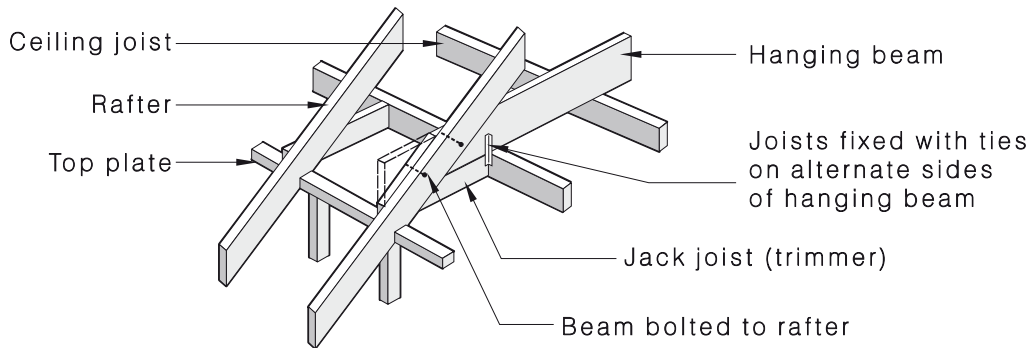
SUPPORT OF HANGING BEAM WITH JACK JOIST (TRIMMER)
